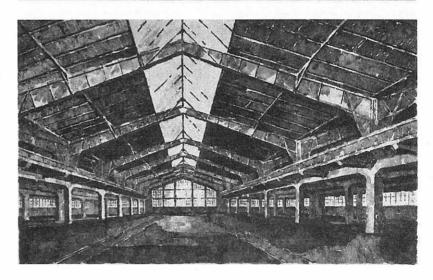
and 22. First design of exhibition hall "Stadt und Land" in Magdeburg/ Germanyby Bruno Taut and Carl Kraft in 1921. Staggerd wood girders made out of benched girders.
